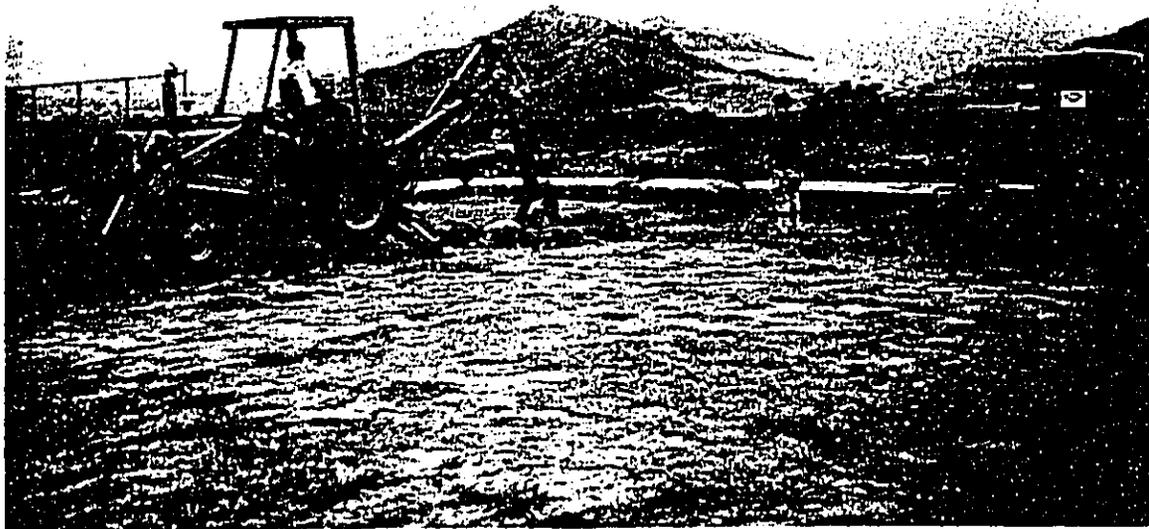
General View of the Project Area, Excavation in Progress of Trench 1, Shot to the Southwest
